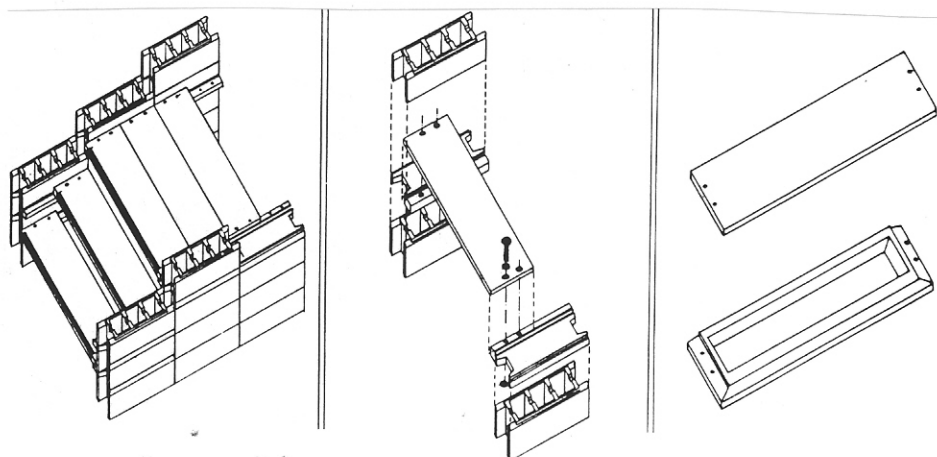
The Jordanian stair of Building System # 5 (RSC 1988)(6).
